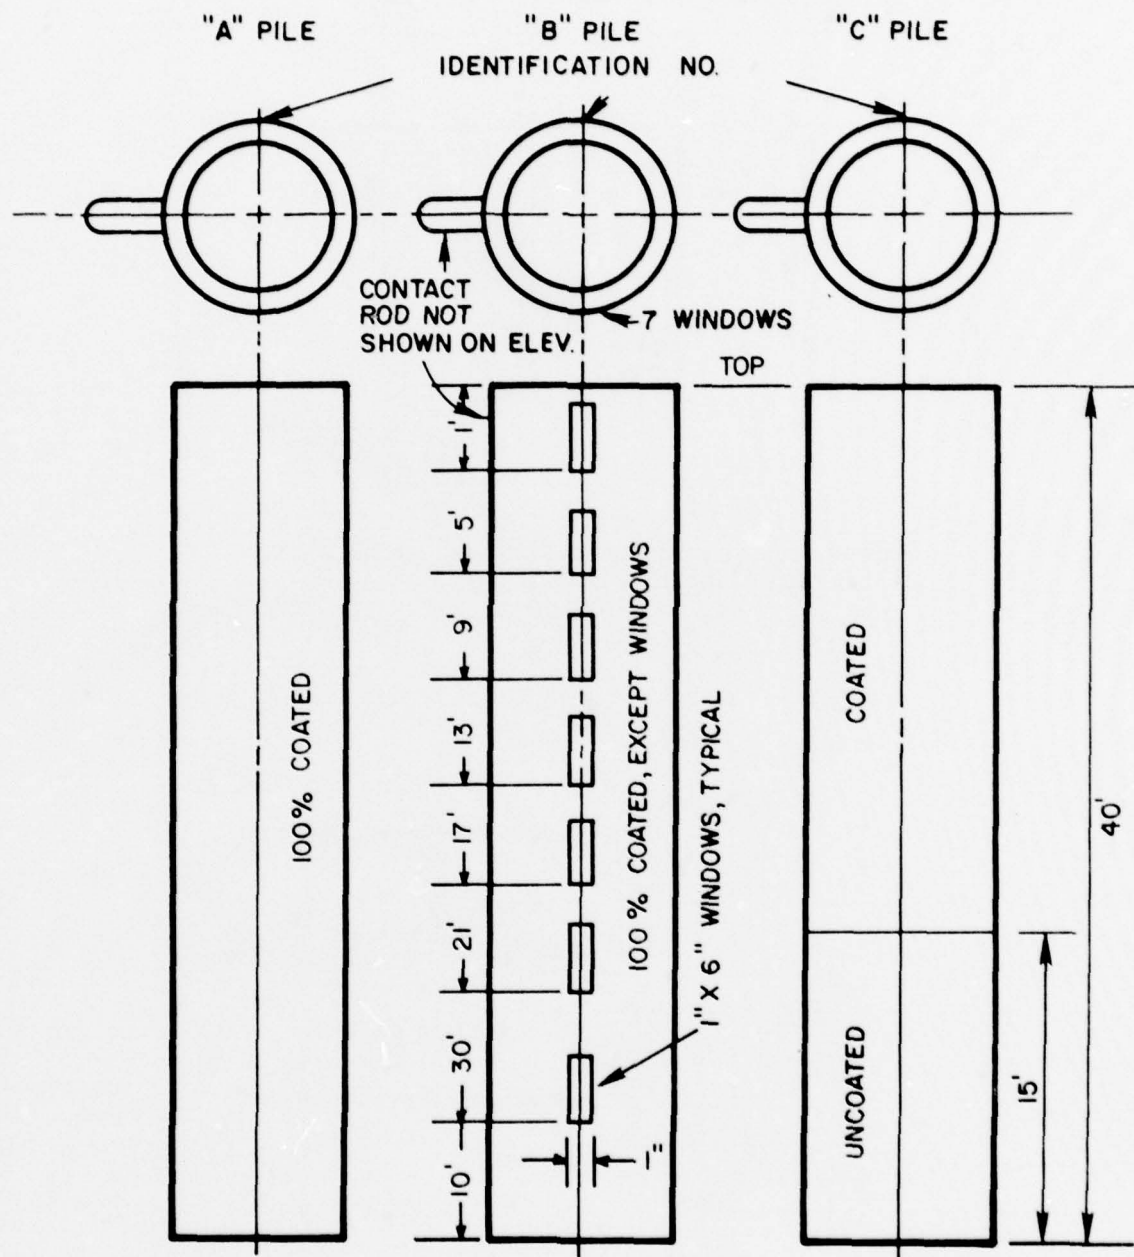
Pipe piling coating detail. (Metric conversion factors:
